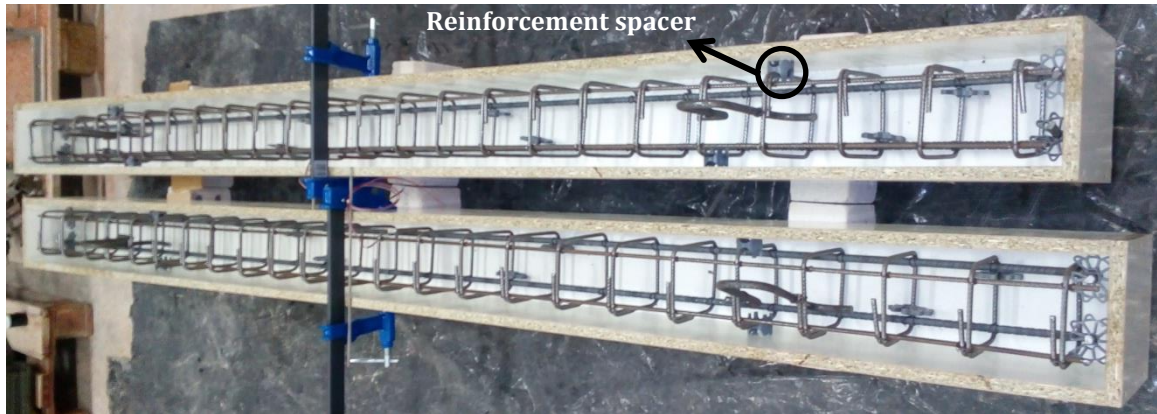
Installation of the steel reinforcement cages to the molds.
